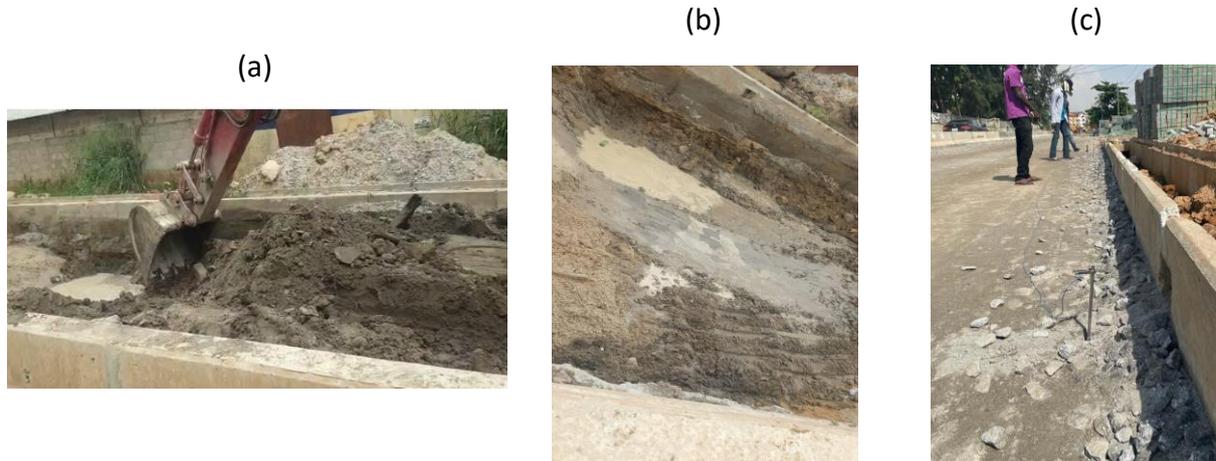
(a, b) Excavation of Clayey/Peat section along Traverse 1 during construction (c) A stable section of the road
